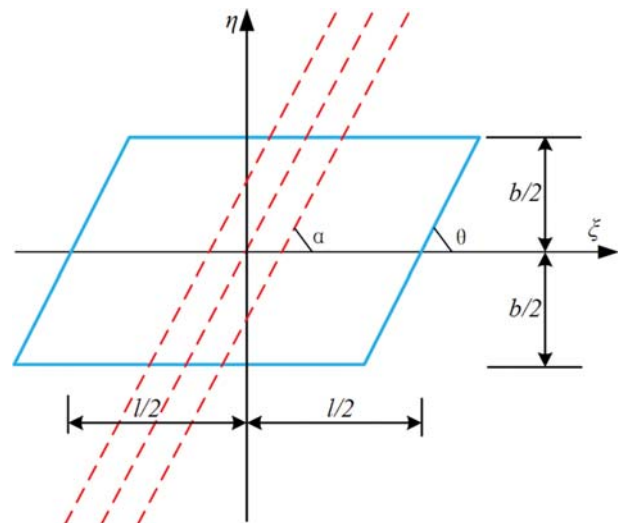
Plane Projection of Foundation Pit and Tunnel Location
